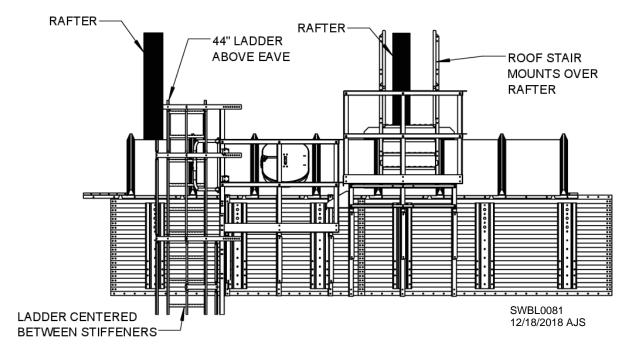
Ladder & platform locations with 3 stiffeners & 4 roof sheets per sidewall sheet
